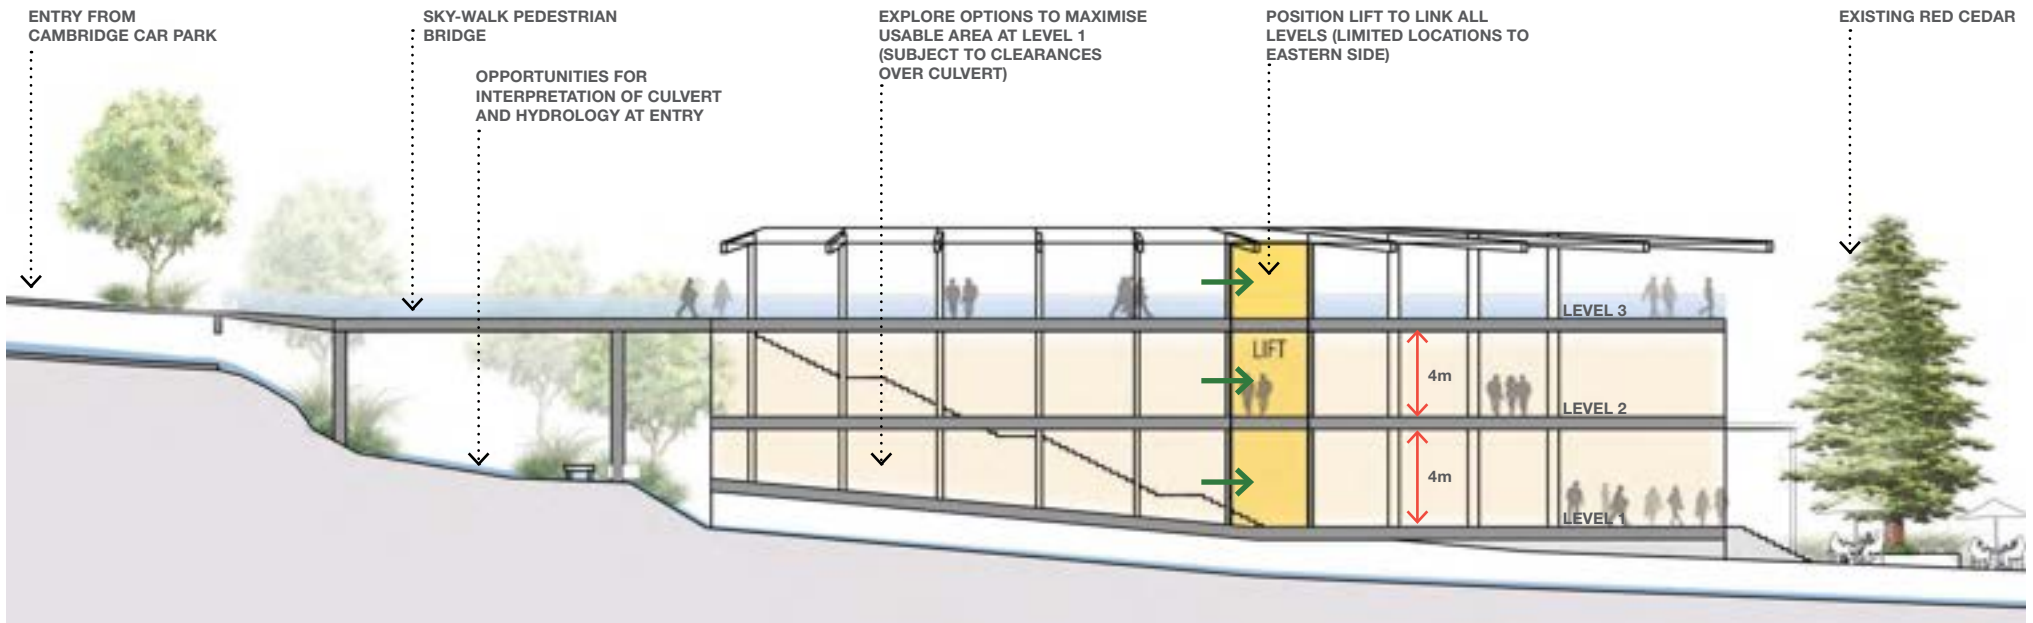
Indicative sketch section showing proposed Gateway Centre
